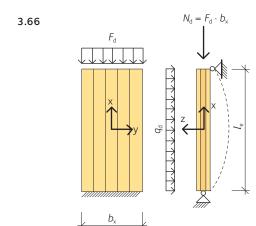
CLT wall panel subject to transverse load and compressive force.
